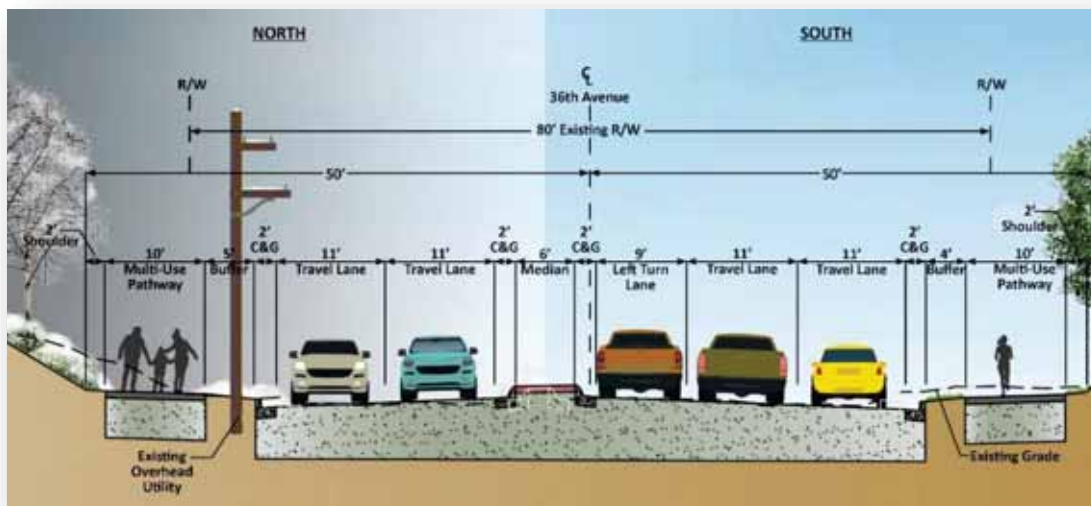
36th Avenue (A Street to Old Seward Highway) – Alternative 3
